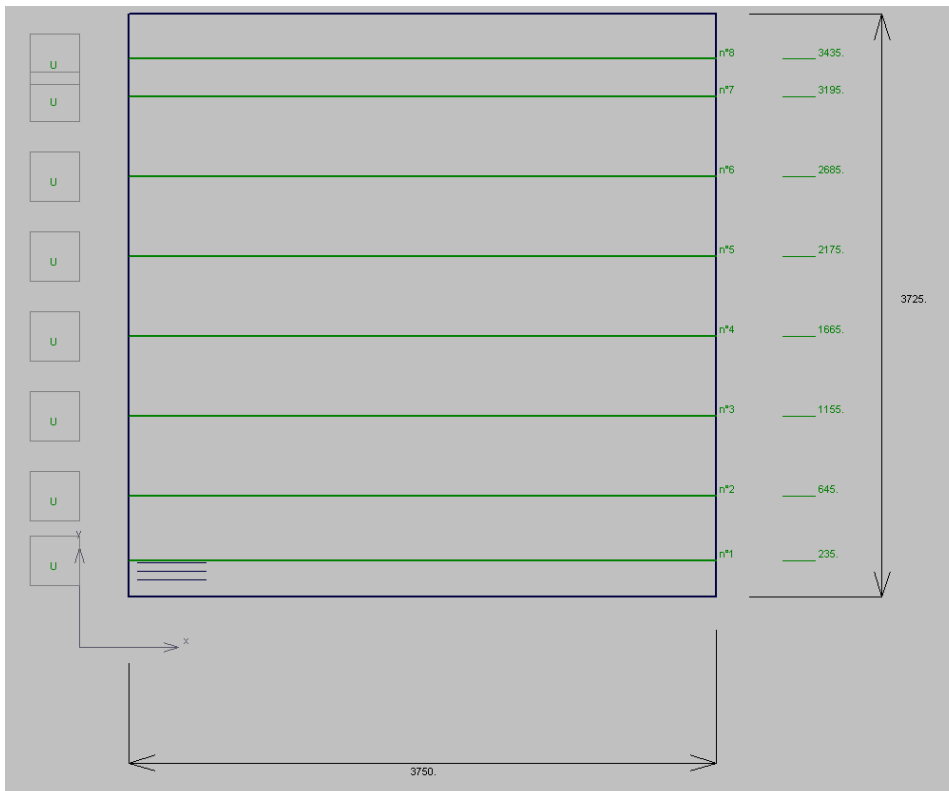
Illustration of a plate panel 1 of the roadway girder including dimensions
